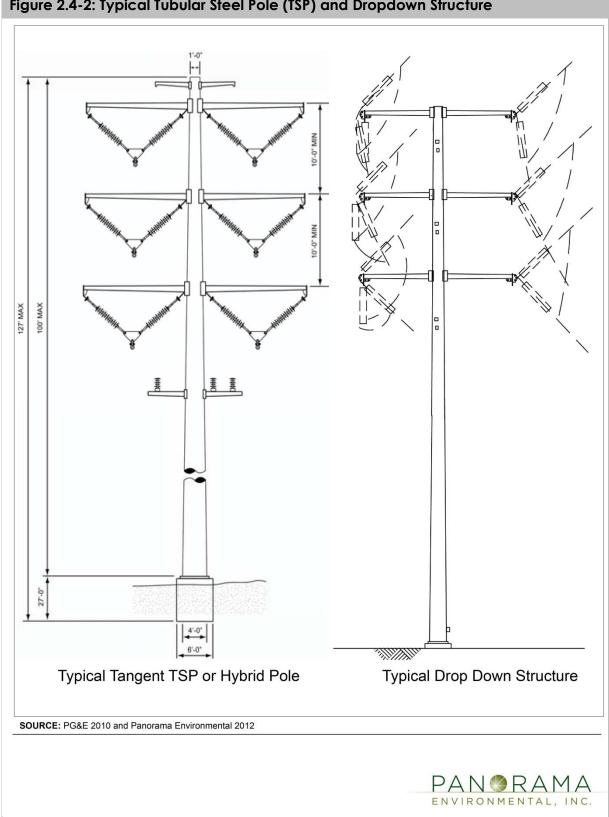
Typical Tubular Steel Pole (TSP) and Dropdown Structure
